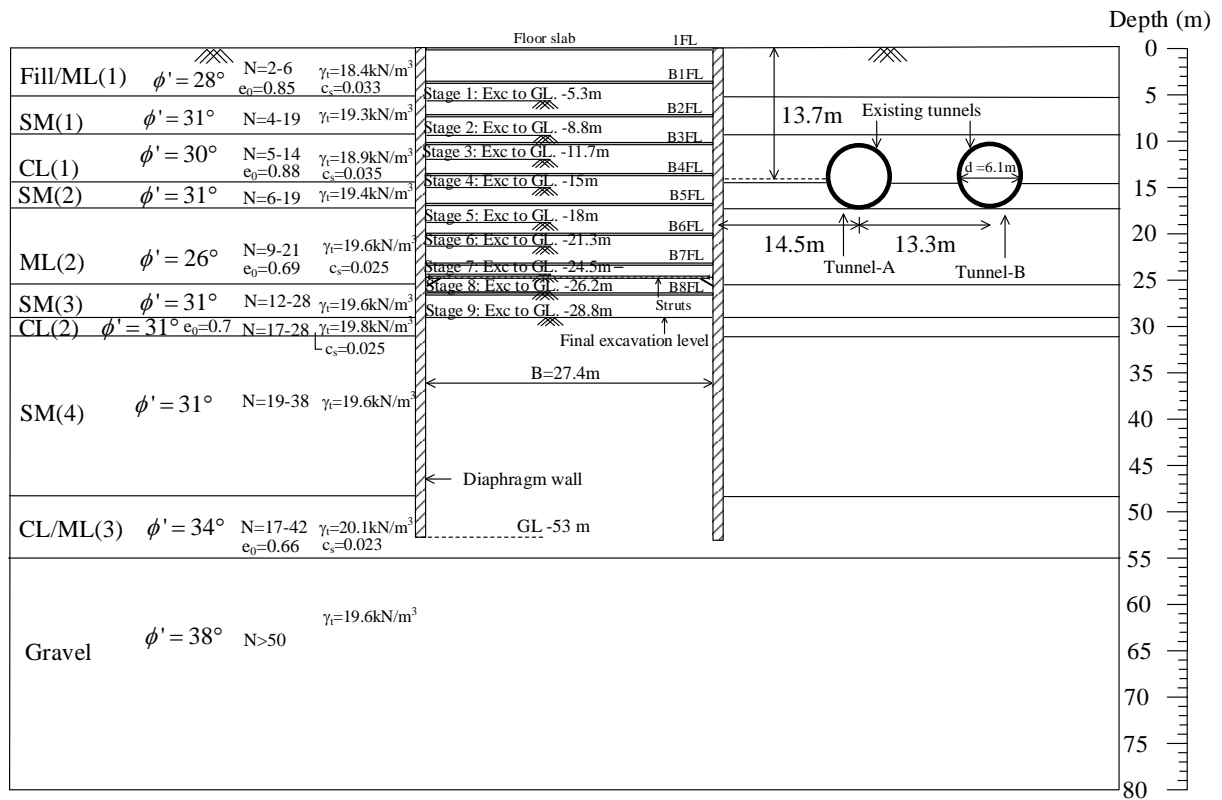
Profile of the excavation sequence and subsurface soil layers for Case 2
